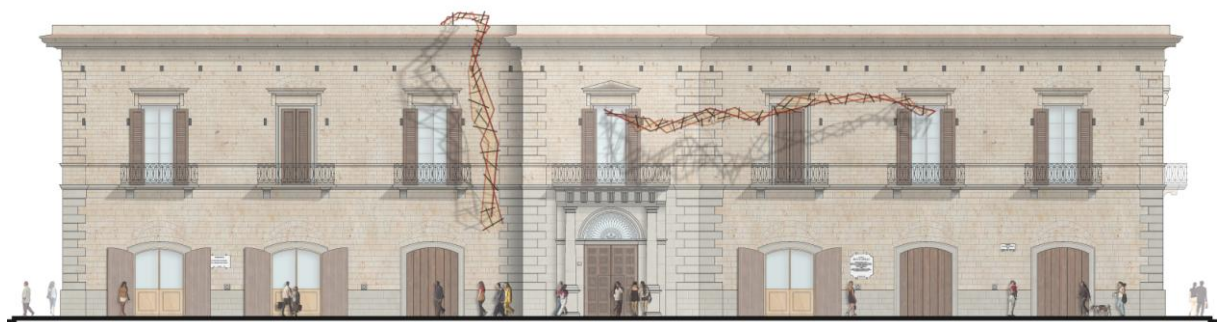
Pontrelli Building, main elevation, reticular bean for theater
